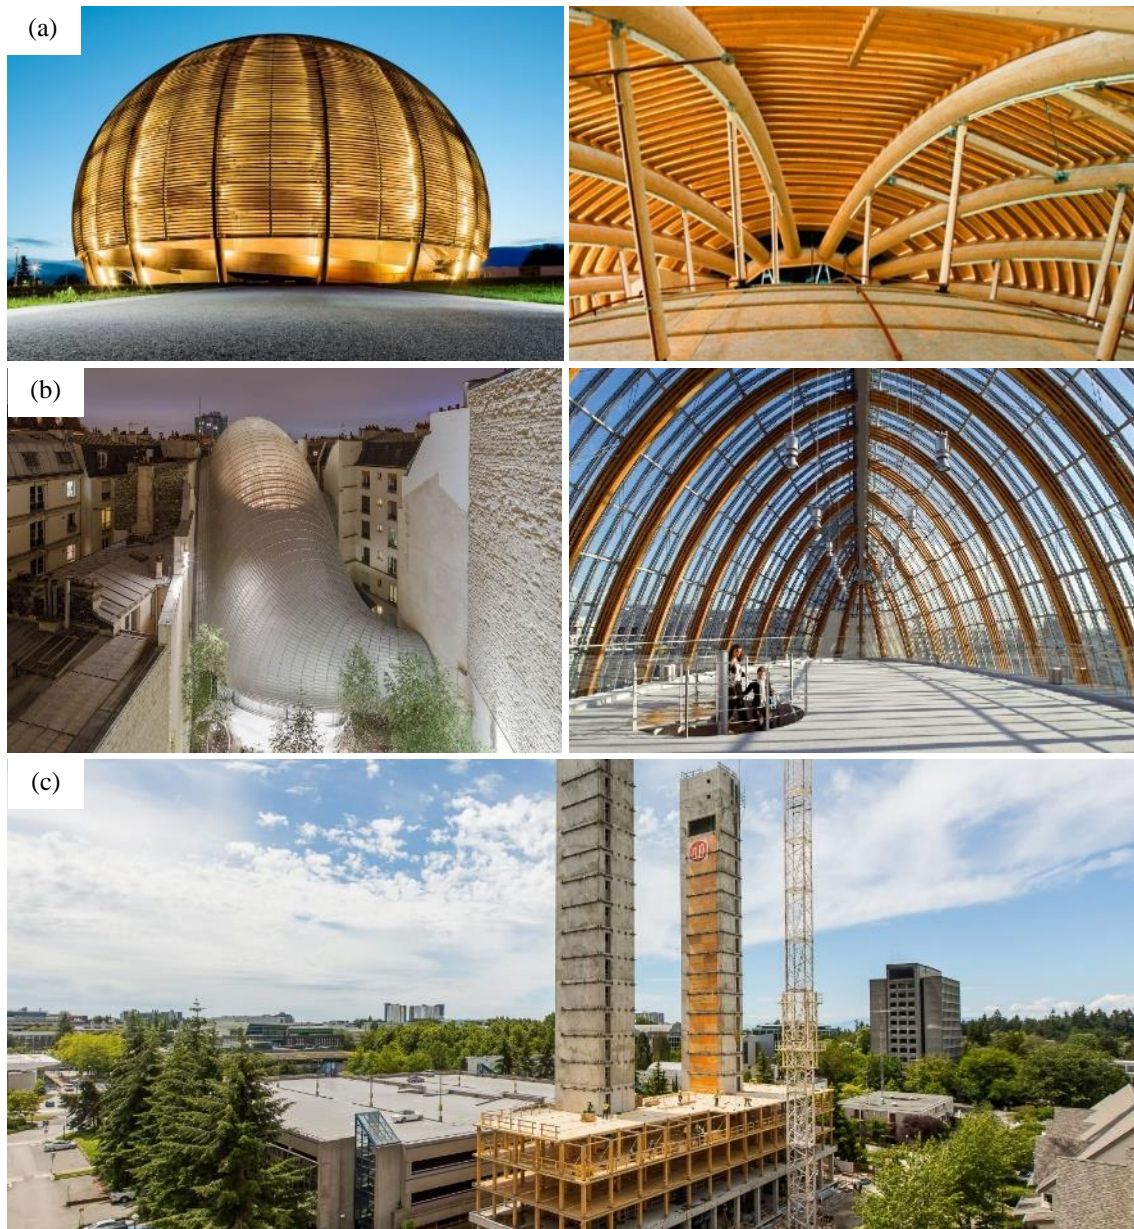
Modern timber structures : (a) *The Globe of Science and Innovation*, CERN Museum, (b) *Fondation Jérôme Seydoux-Phaté* by Renzo Piano, (c) *Brock Commons*, the tallest mass timber building under construction in Canada.
